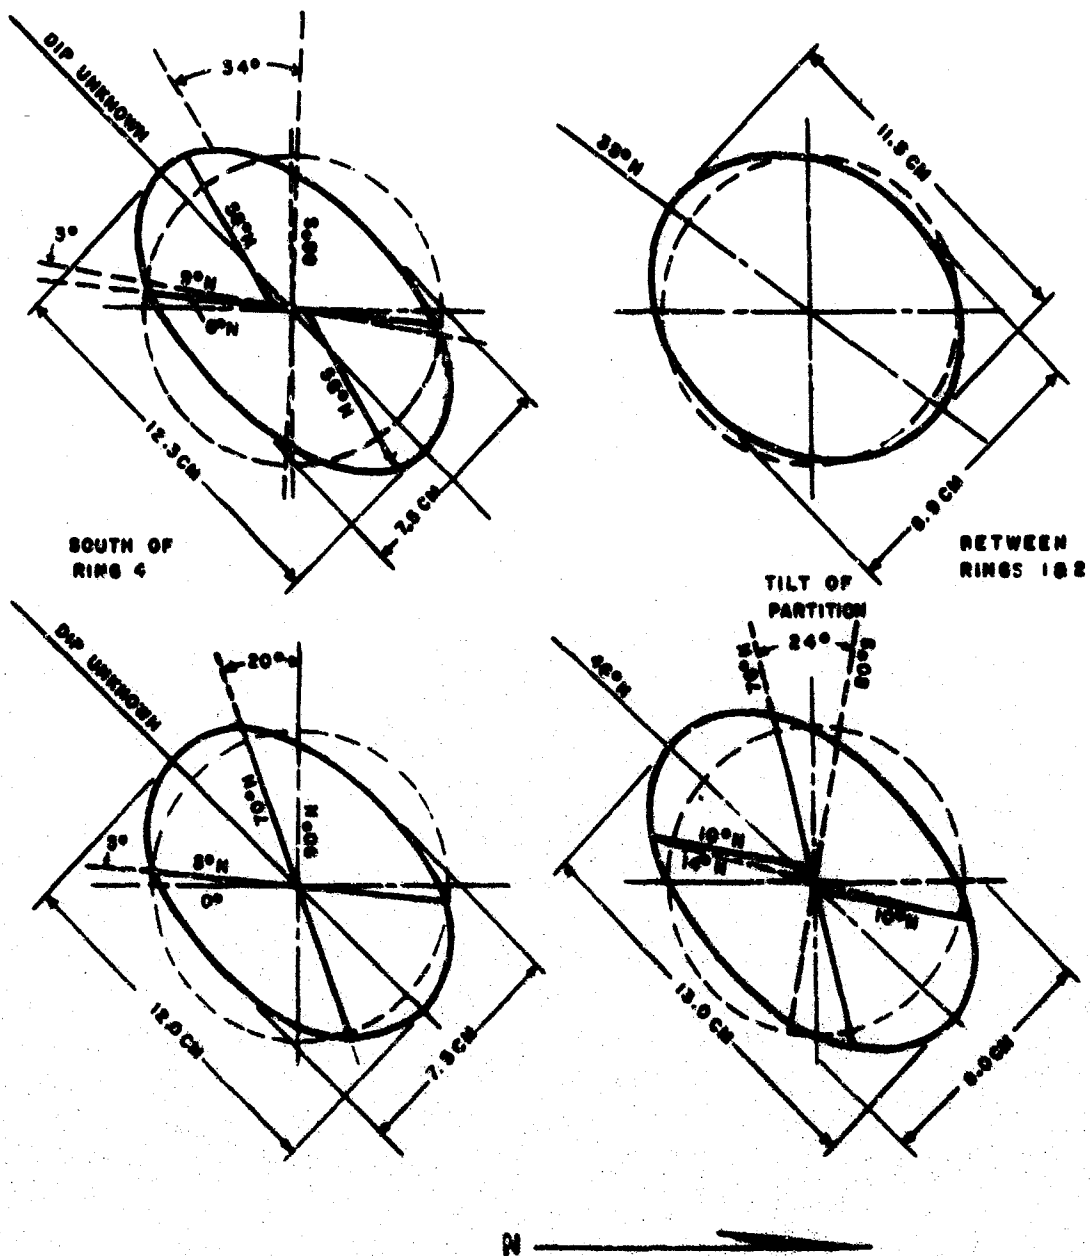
Deformation of cores and tilt of partitions, west wall of tunnel.
